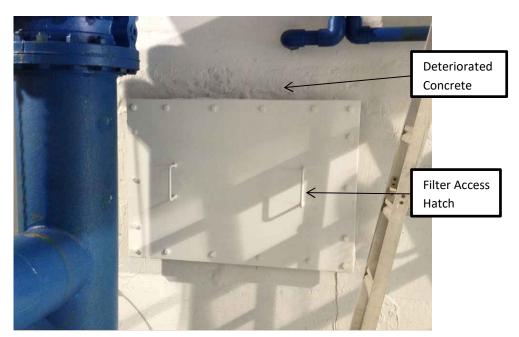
Filter Hatch in Concrete Filter Wall
